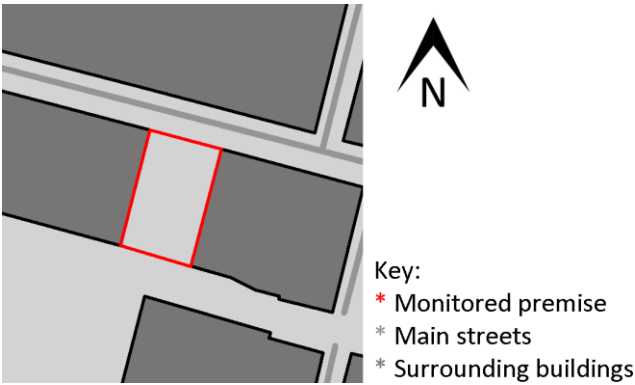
Site plan of Building 2 (Not to scale) (image adapted from (Google 2012))
